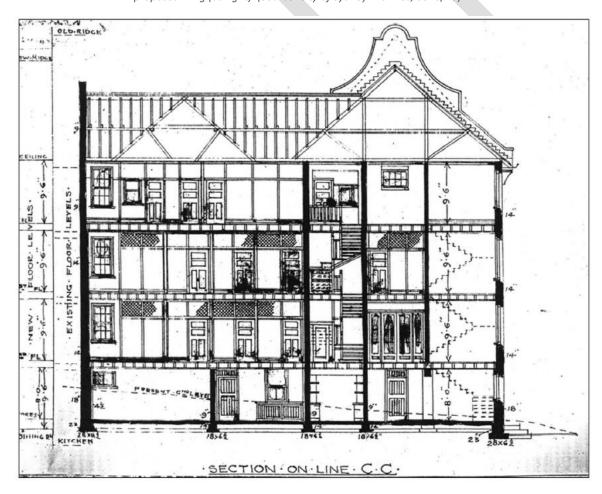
Long Section through the front of the proposed addition which also shows that an Anglo-Dutch inspired parapet, much like the gabled ends of the ASN Building, was considered for the gable end. (Source: City of Sydney Archives, 0540/25)
